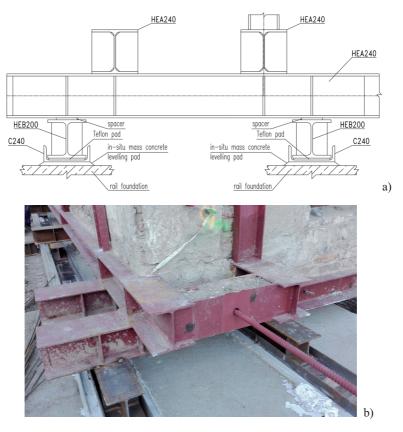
Outer node of the bottom frame of the stiffening structure of building No. 15; a) design detail; b) erected structure
